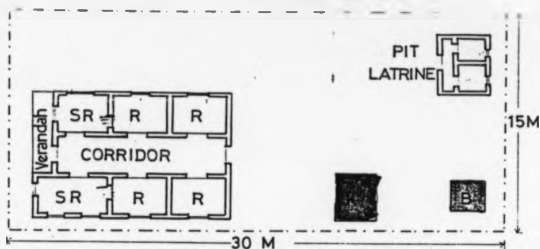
Plan of a Face-Me-I-Face-You Building
